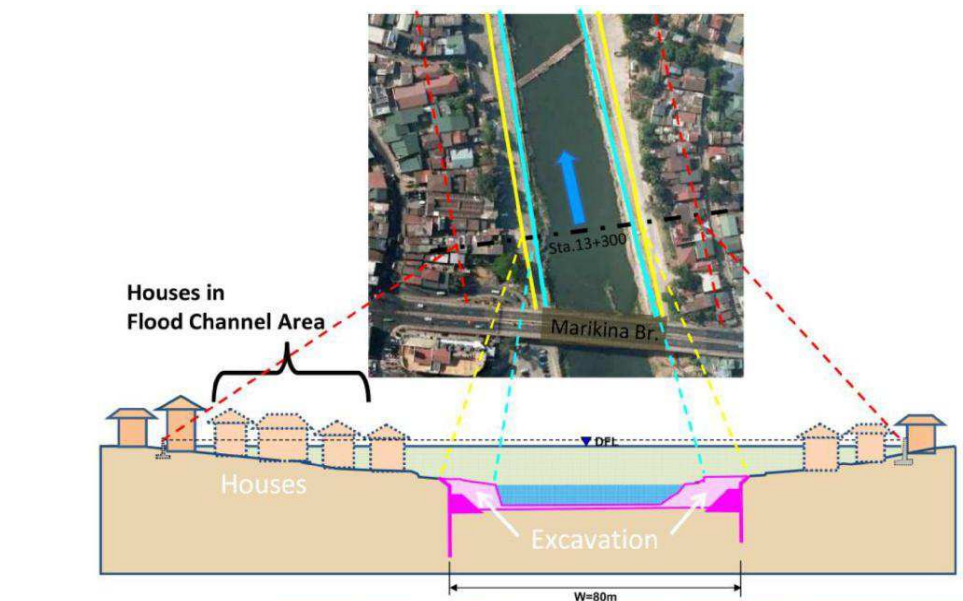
Plan of Dike and Widening Low Water Channel at Downstream of Marikina Bridge
